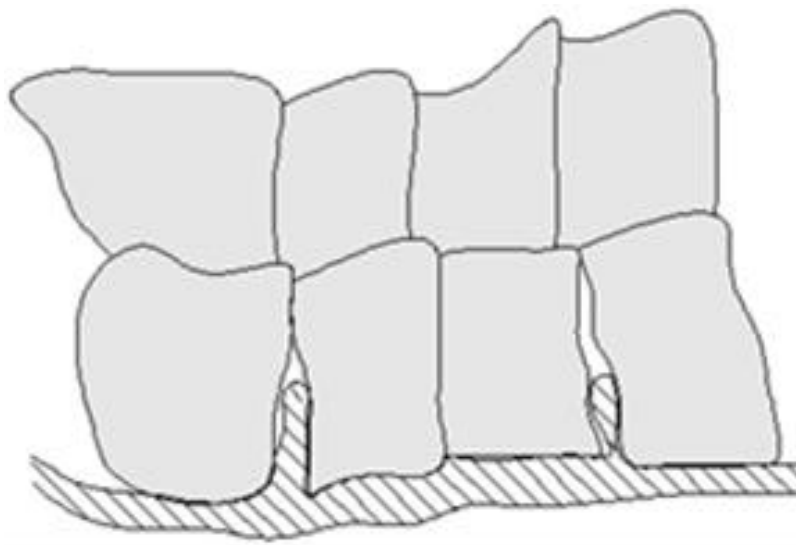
22 Plugging of open joints and fractures (Stacey 2001)
